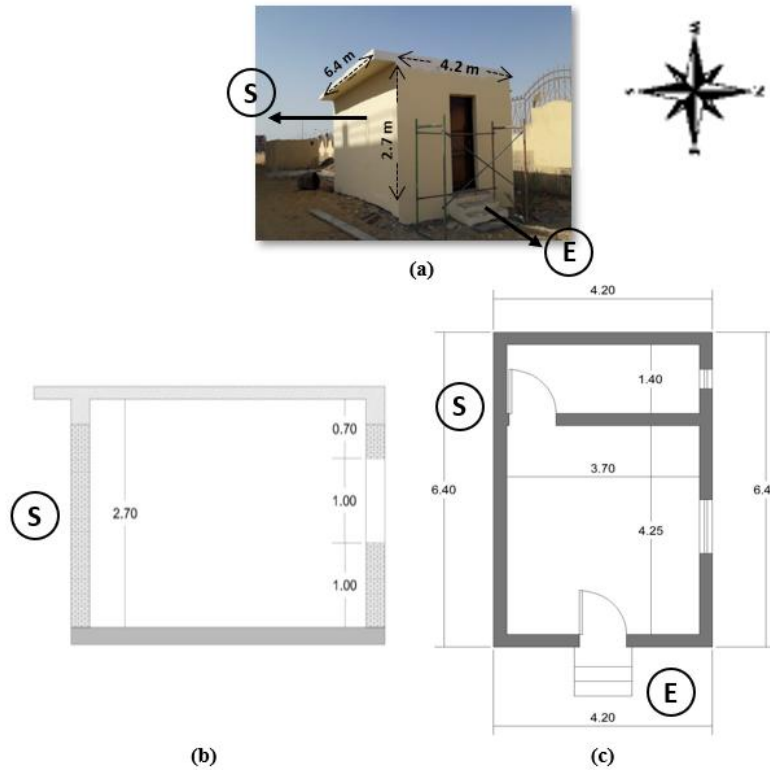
(a) A photo, (b) cross sectional elevation and (c) plan of the test room. All dimensions are in m.
